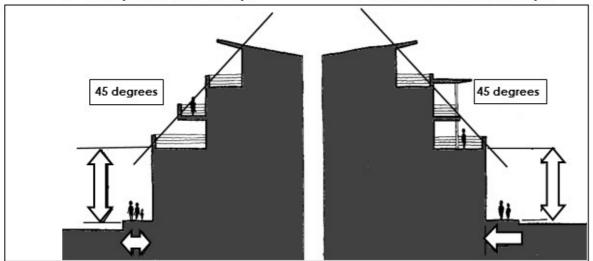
Building envelopes - Cross sections through street + laneway frontages
